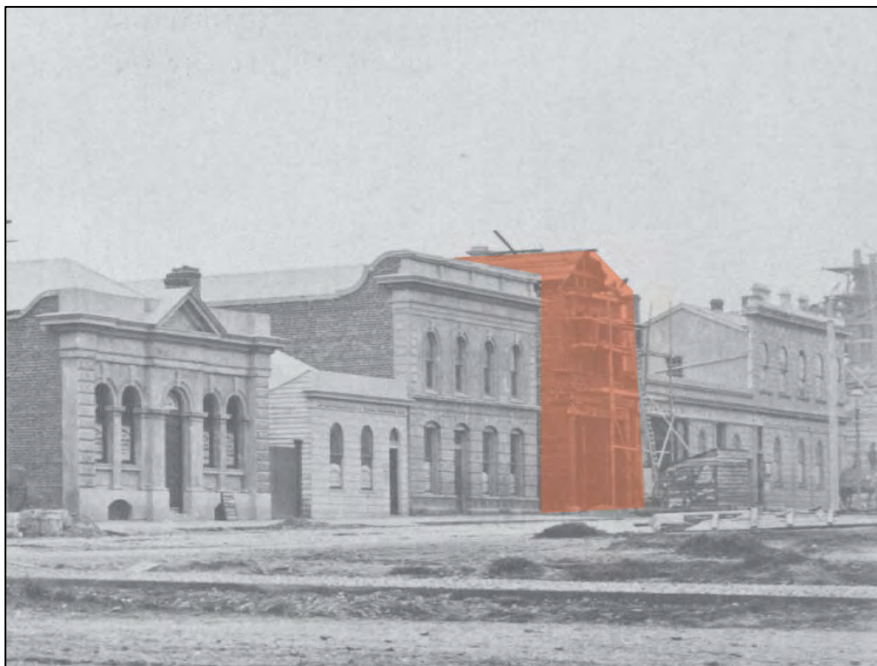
Detail from a late 1878 photograph showing the building at 18 Esk Street under construction (highlighted in red) (Southland Museum and Art Gallery, 1878).
